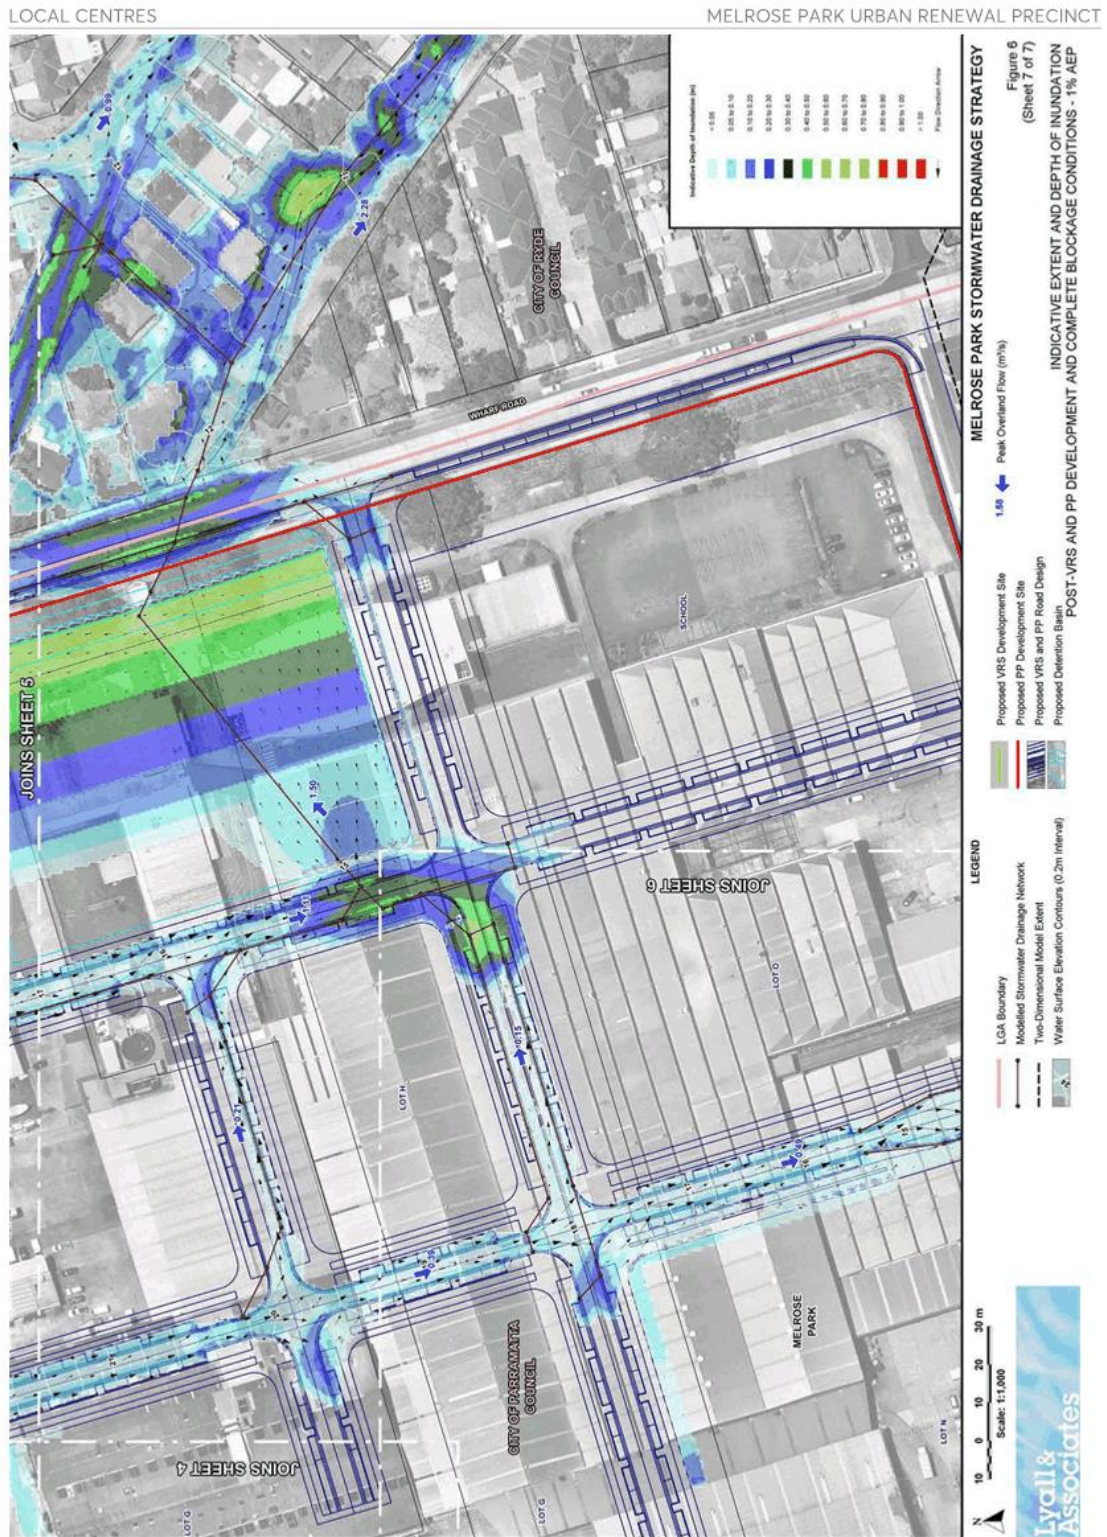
Melrose Park Stormwater Sheet 7 (Source: Lyall & Associates)
